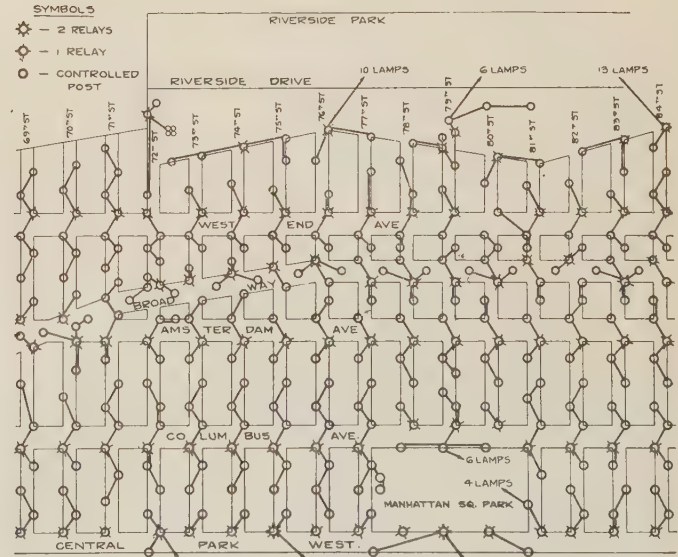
TYPICAL MULTIPLE STREET LIGHTING REMOTE CONTROL (AREA 64TH TO 84TH ST., WEST SIDE, NEW YORK CITY)
